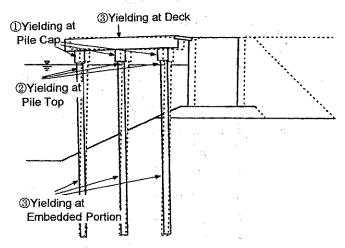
Acceptable Order of Yielding for Pile Supported Pier
